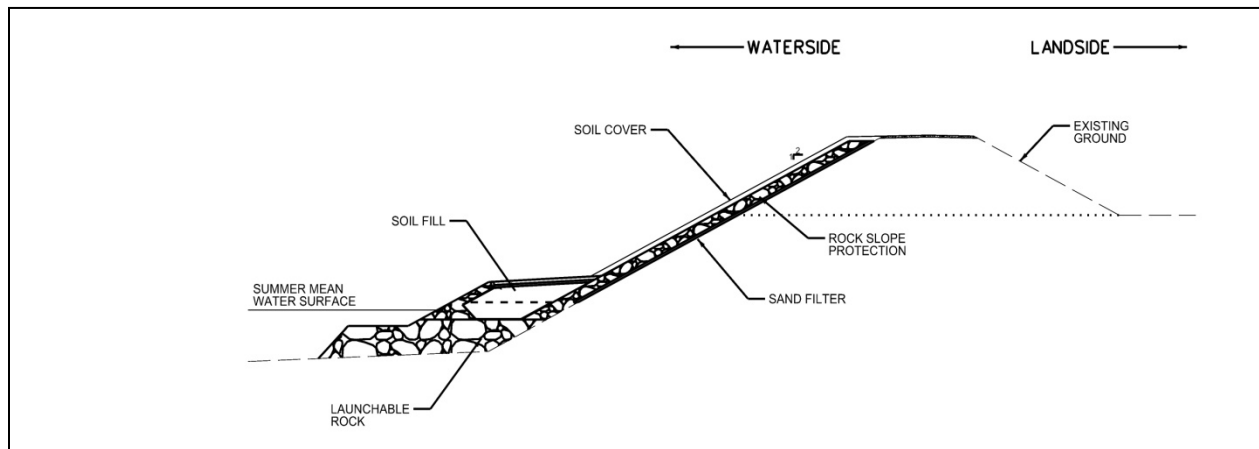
Bank protection generic design section and assumptions (insufficient bench)
